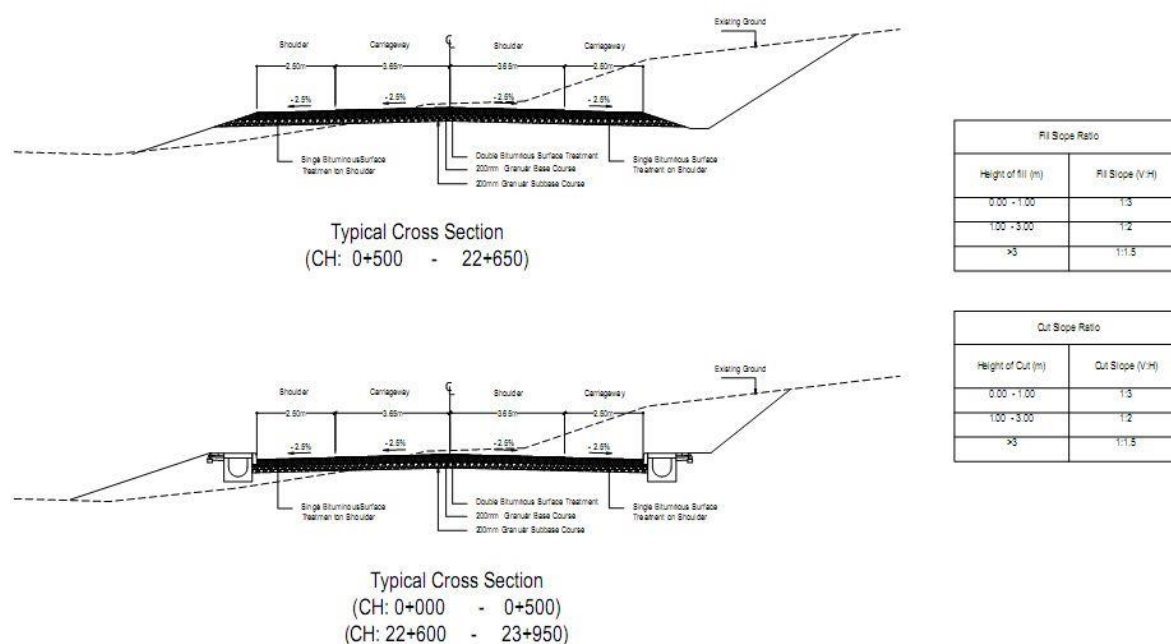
Typical Cross Section of Asutuare – Aveyime Road (Section 2 Project Road)
